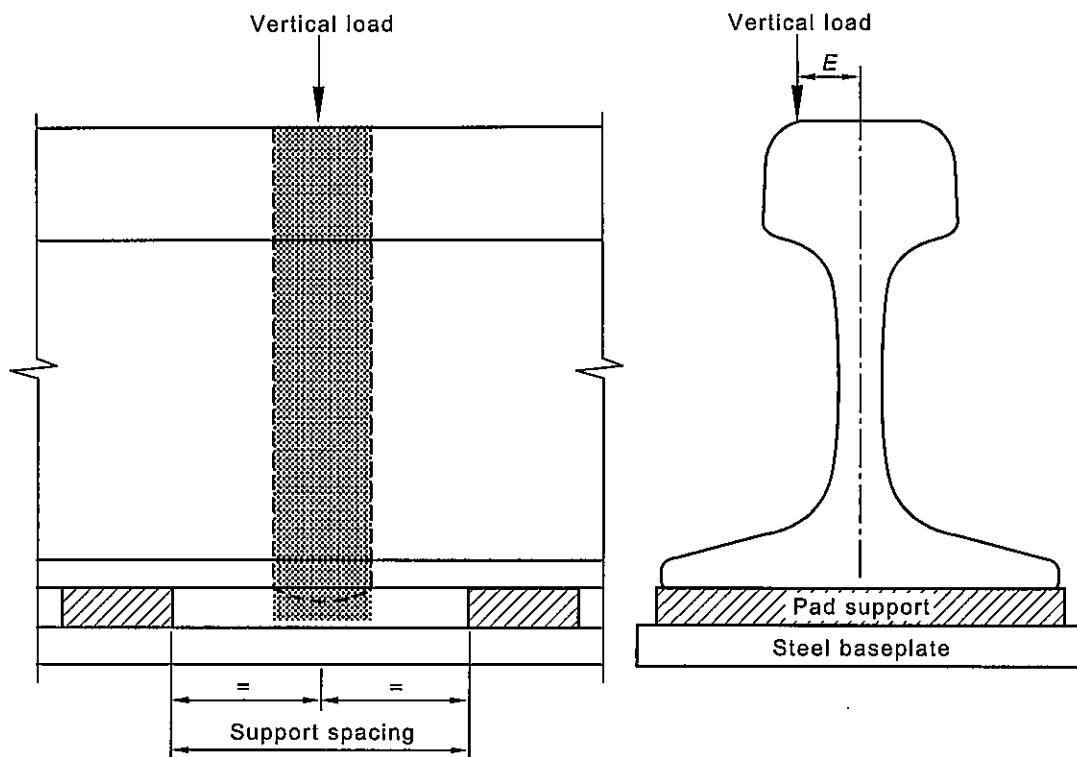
TYPICAL ASSEMBLY FOR THE FATIGUE TESTING OF WEB OF WELDED RAIL
